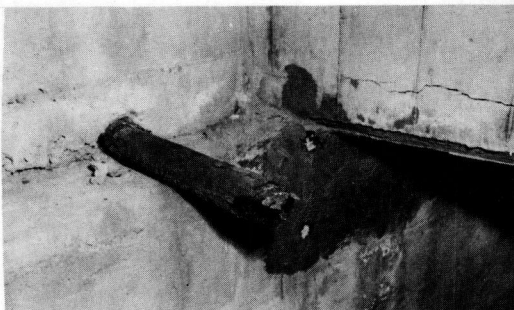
Typical condition of open cracks in beams. Projecting member is an iron pipe sleeve installed through end diaphragm during construction and now completely disintegrated.
